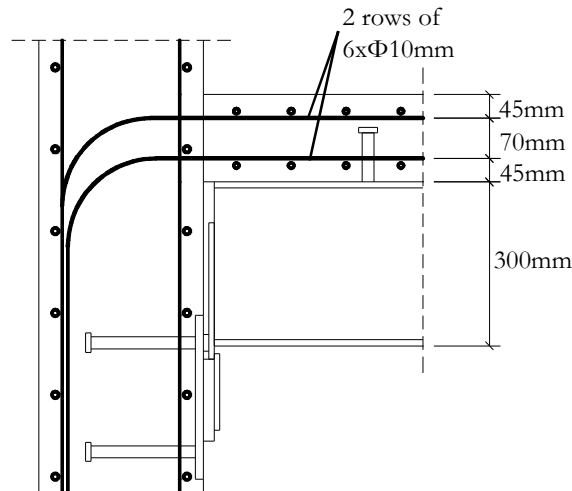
Joint configuration with two rows of longitudinal reinforcement bars
